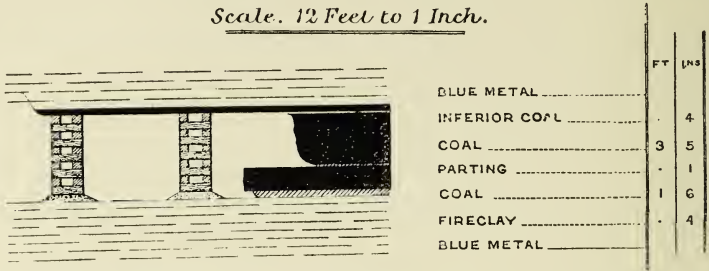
PENDLEBURY COLLIERY, NEAR MANCHESTER. SECTION OF RAM'S MINE COAL SEAM AND TIMBERING IN IT.
